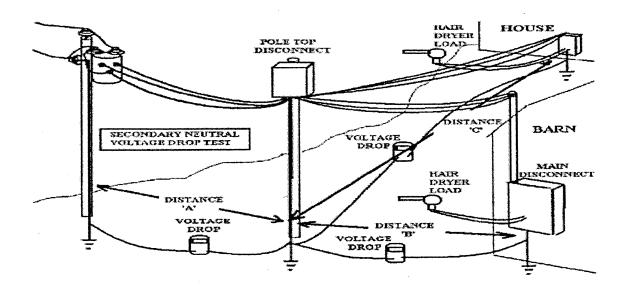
, Secondary Neutral Voltage Drop Test Arrangement.
